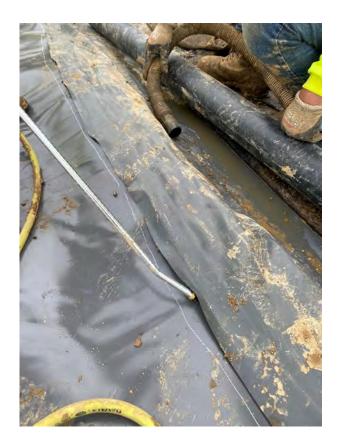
Air lance testing wedge weld seam at floor.
